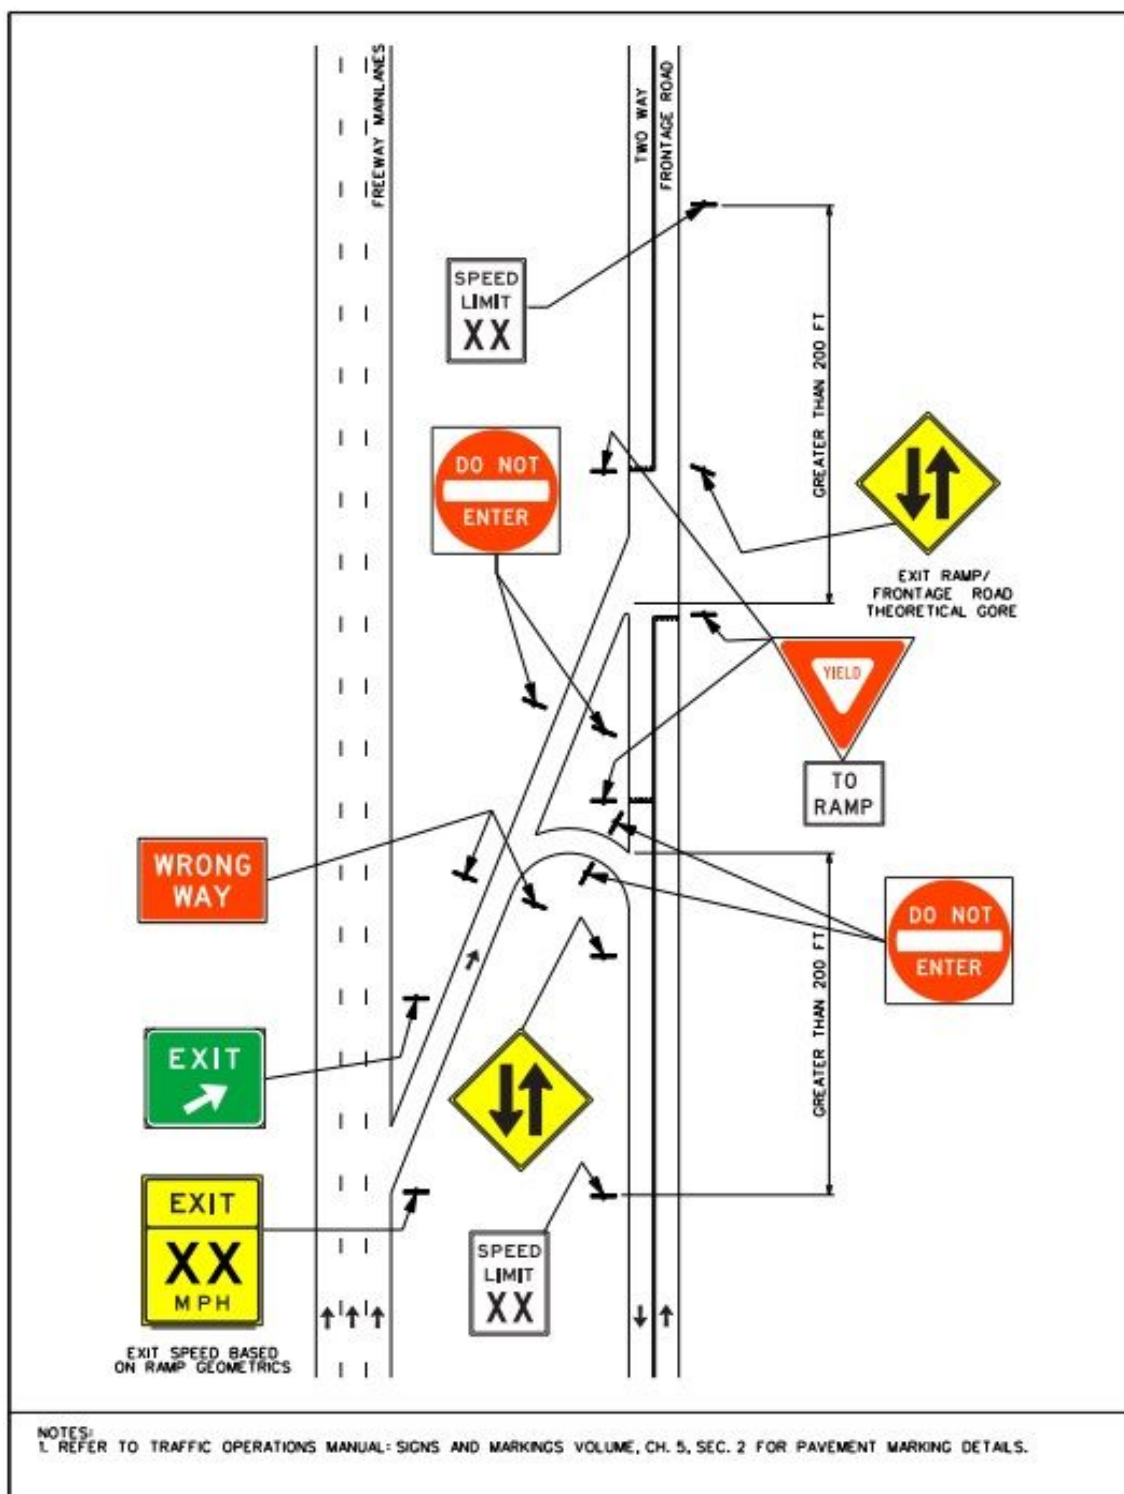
Typical signing for an exit ramp to a two-way frontage road.
